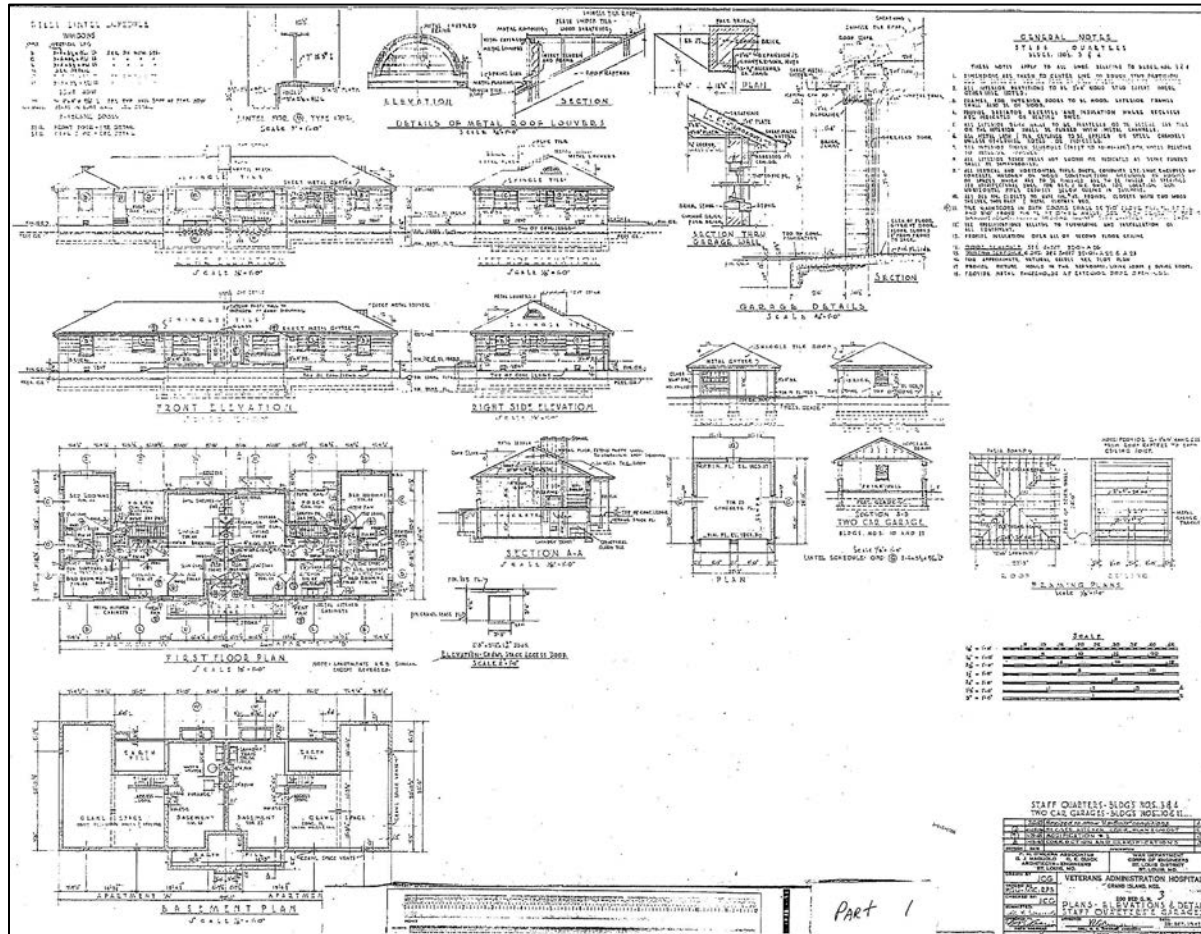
Plans and elevation drawings of the staff quarters (Building # 3 and Building #4) and accompanying garages (Building #10 and Building #11) (VA).
